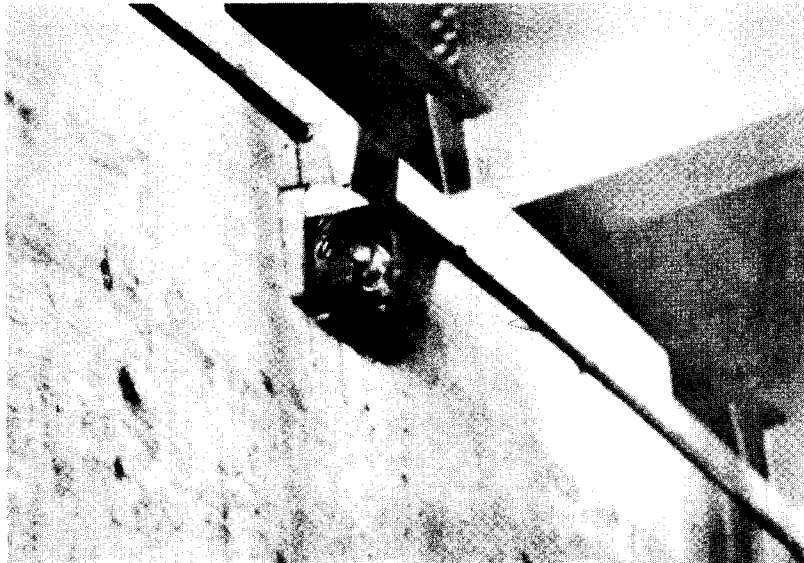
A wall-mounted bridge underpass luminaire that was probably broken by vandals.
